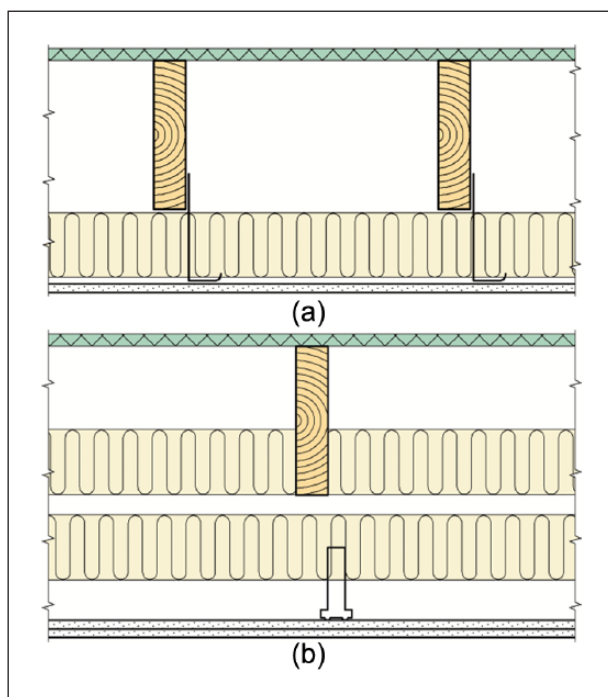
Common types of French wooden joist constructions: (a) type A, FS-CS and (b) type A, FS-CN.
